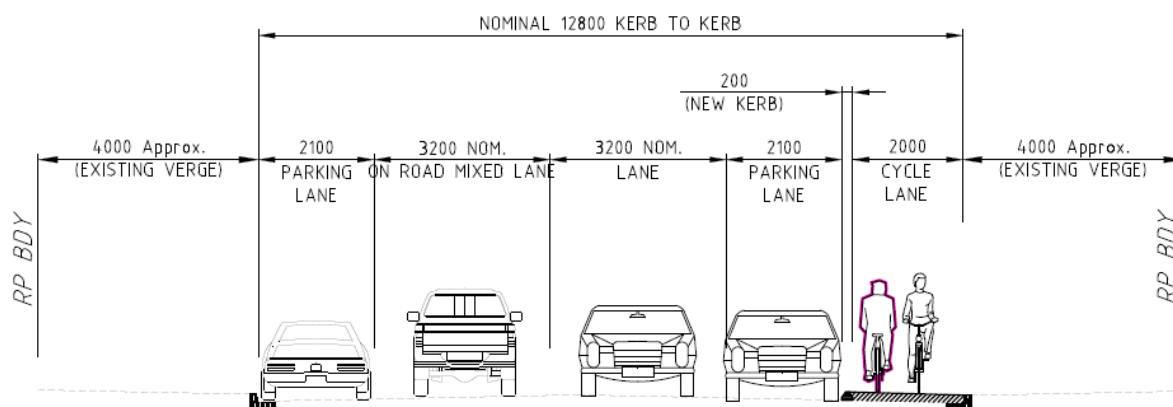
Revised typical cross-section on Livingstone Road with bike path and parking lanes.
